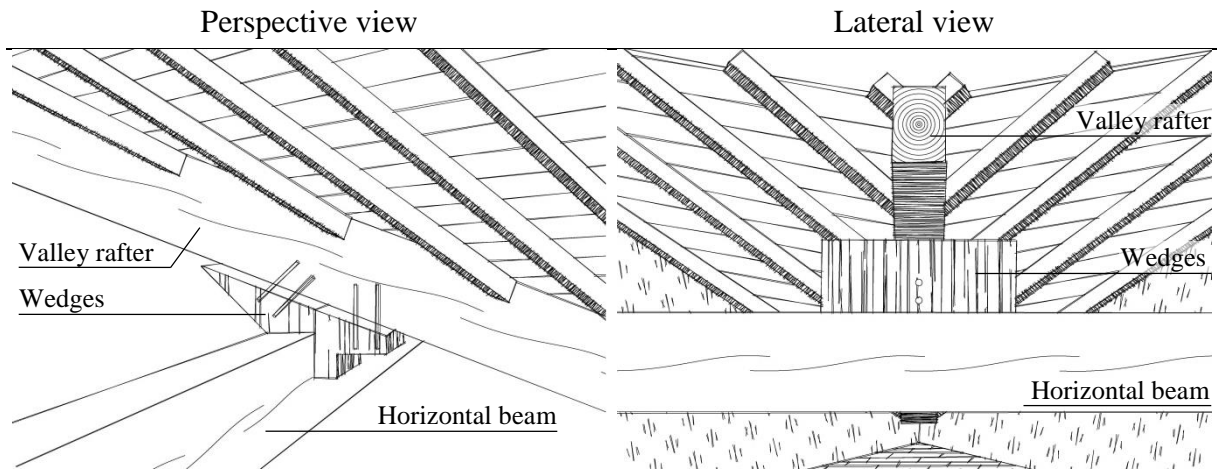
Substitution of the failed horizontal beam and enhancement of the compressive contact area with the valley rafter.
